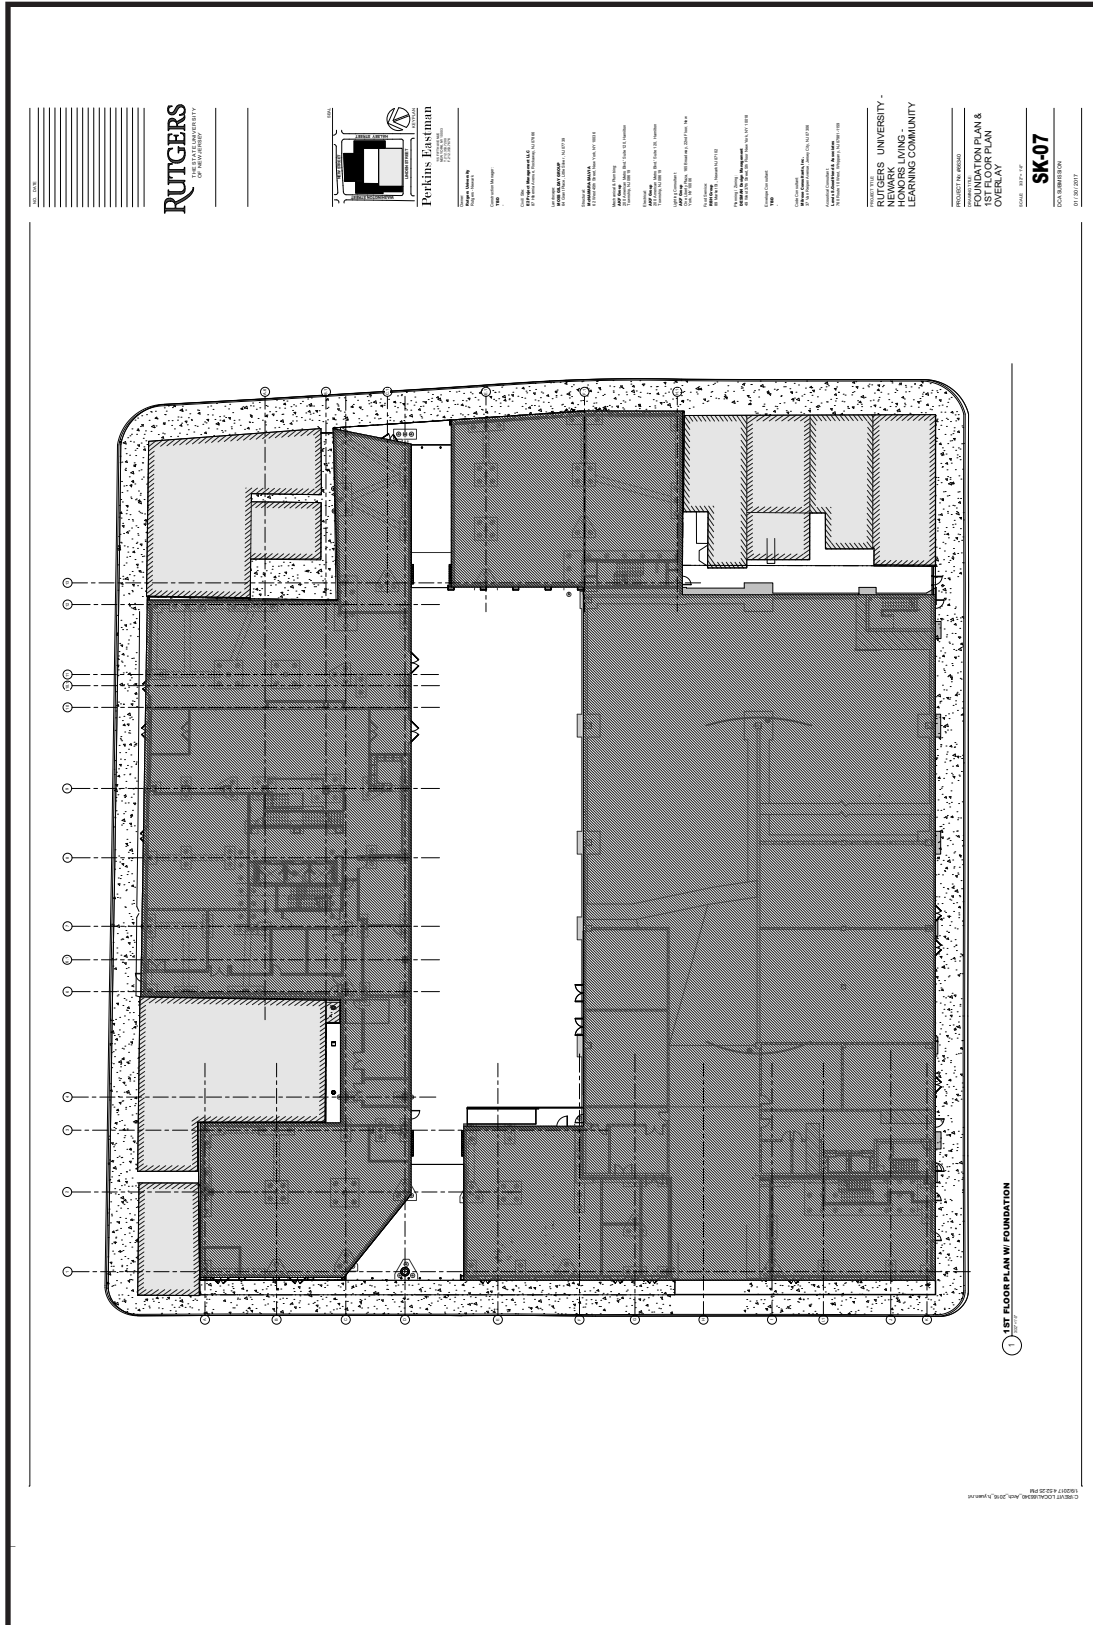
Proposed Rutgers Newark Honors Living-Learning Center. Foundation Plan and First Floor Plan Overlay. Source: Perkins Eastman/Rutgers University 2017.
